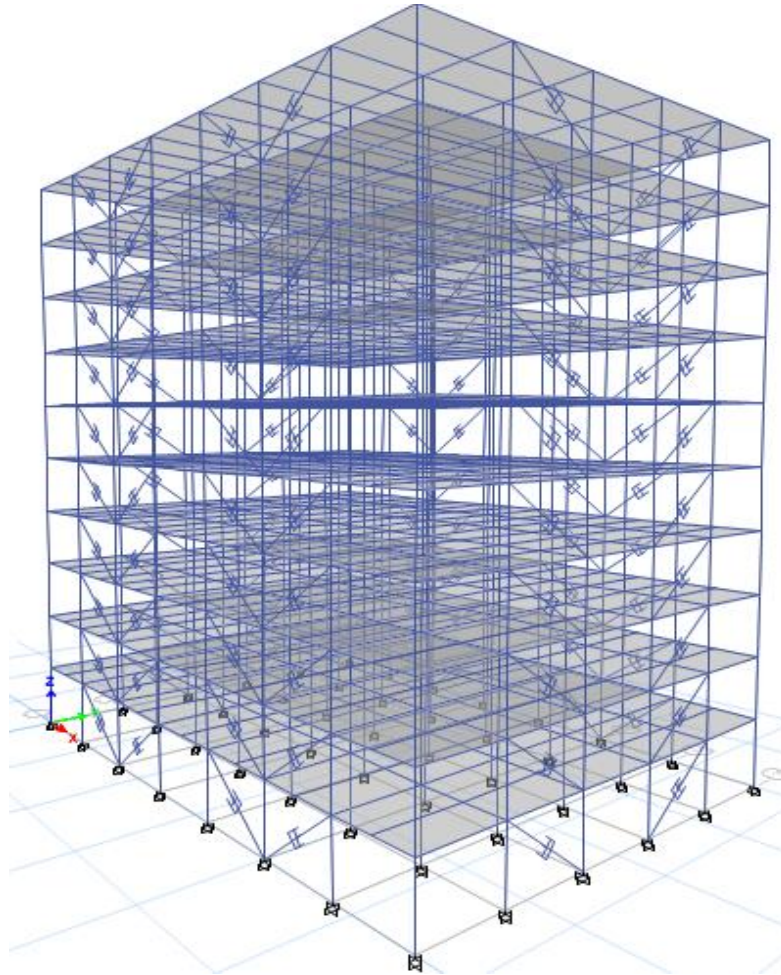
Dampers located between outer corner and mid-frame for 10-story steel building
